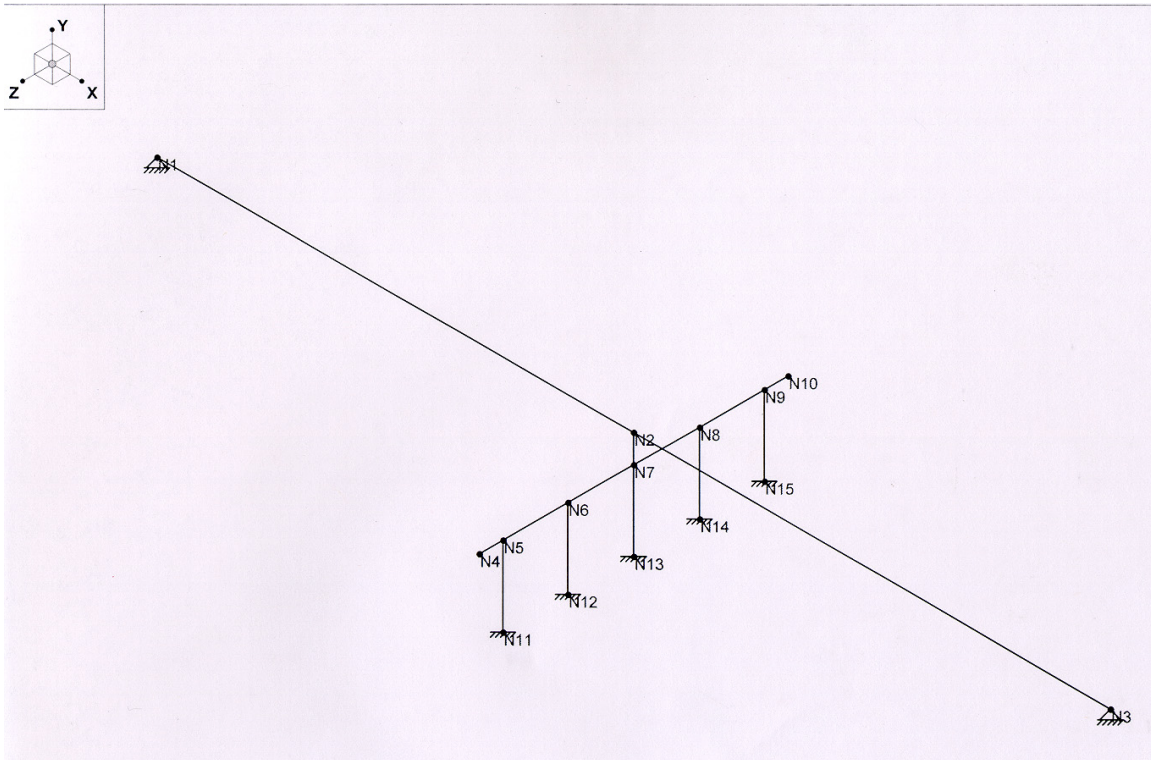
The RISA 3D model of the prestressed concrete girder bridge.
